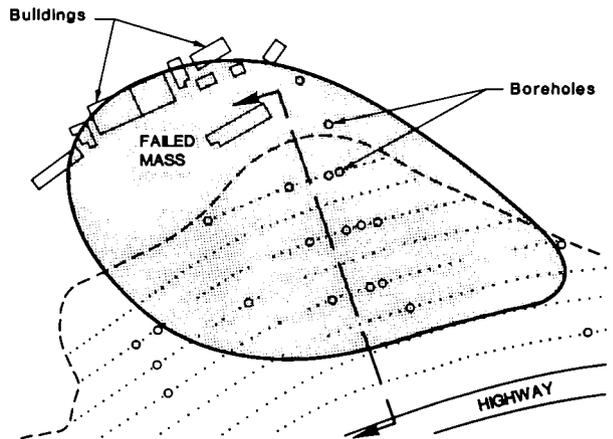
Plan Showing the Extent of the Case 6 Failure
